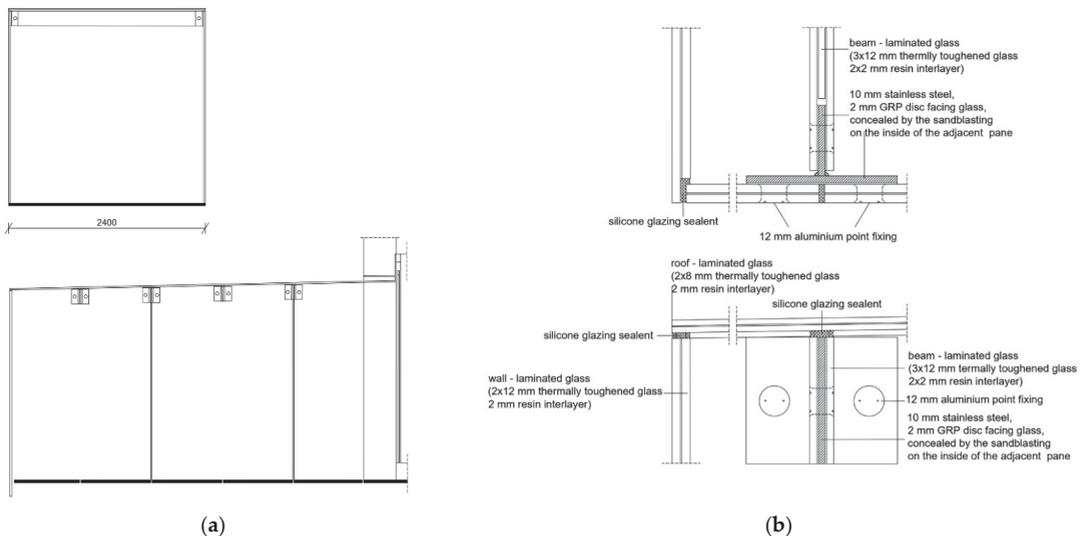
House at King Henry's Road in London: (a) cross-section and longitudinal section through extension; (b) detail of supported glass beam in the shear wall (figures by the author).
